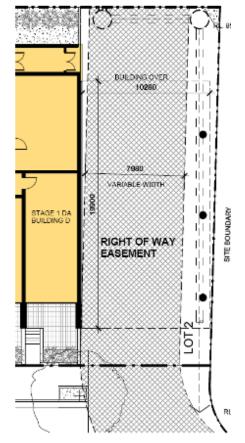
Building D showing structure extending over the proposed Right of Carriageway
